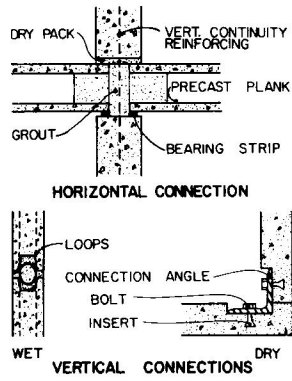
Typical Connections Used in Large Panel Precast Concrete Buildings
